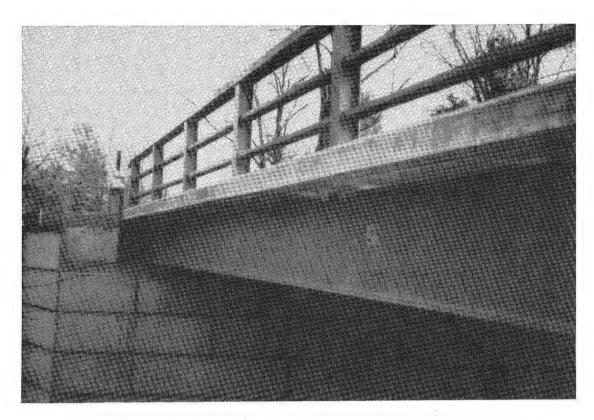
Precast abutment and deck units, Ulsterville Bridge
